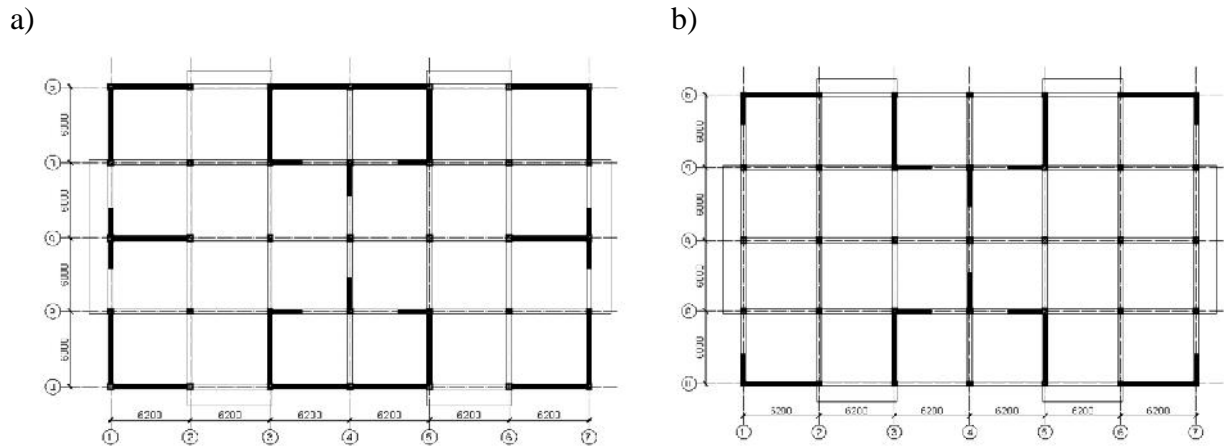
Location schemes of reinforce concrete columns and shear walls
